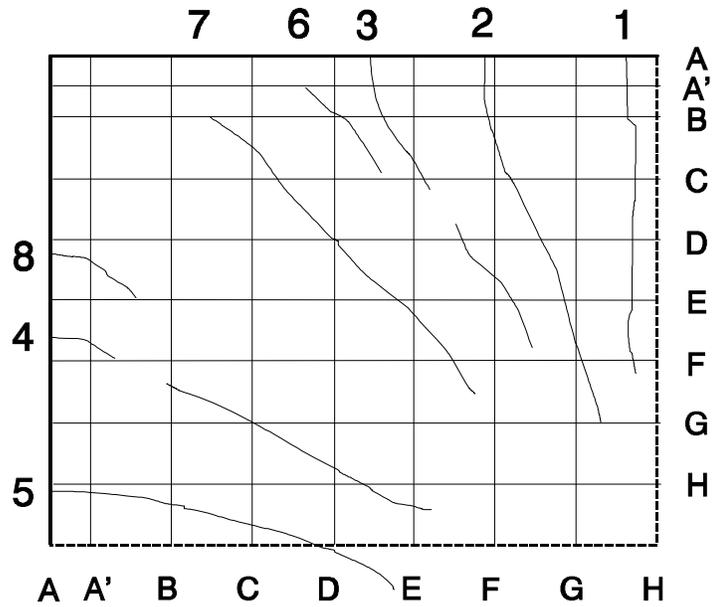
POJ-RC-100-TH cracking pattern on north face of joint at dead load
